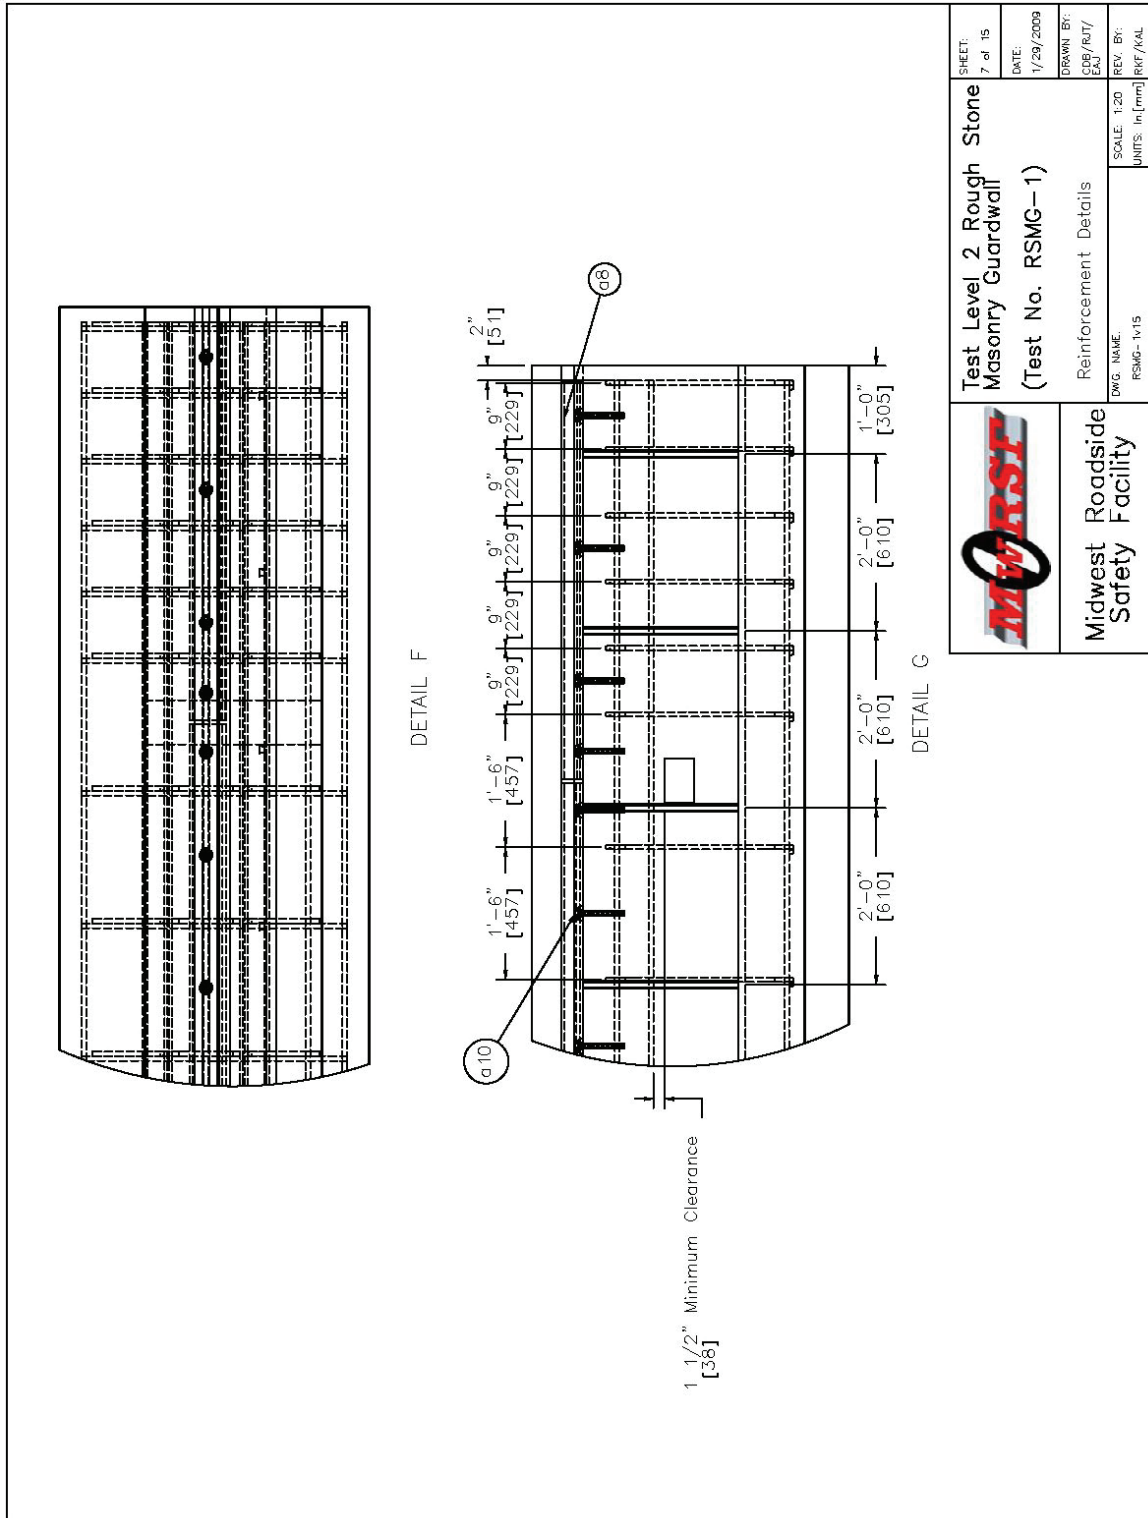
Reinforcement and Angle Attachment Details, Test No. RSMG-1
